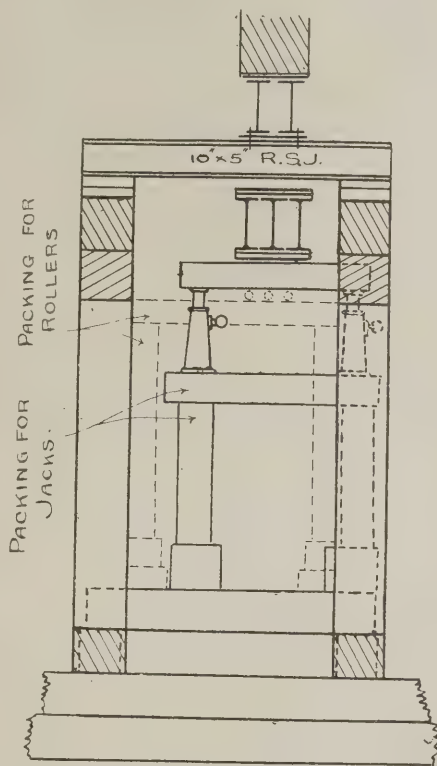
TOP BAY OF SHORING: RAISING NEW GIRDER BY JACKS.
